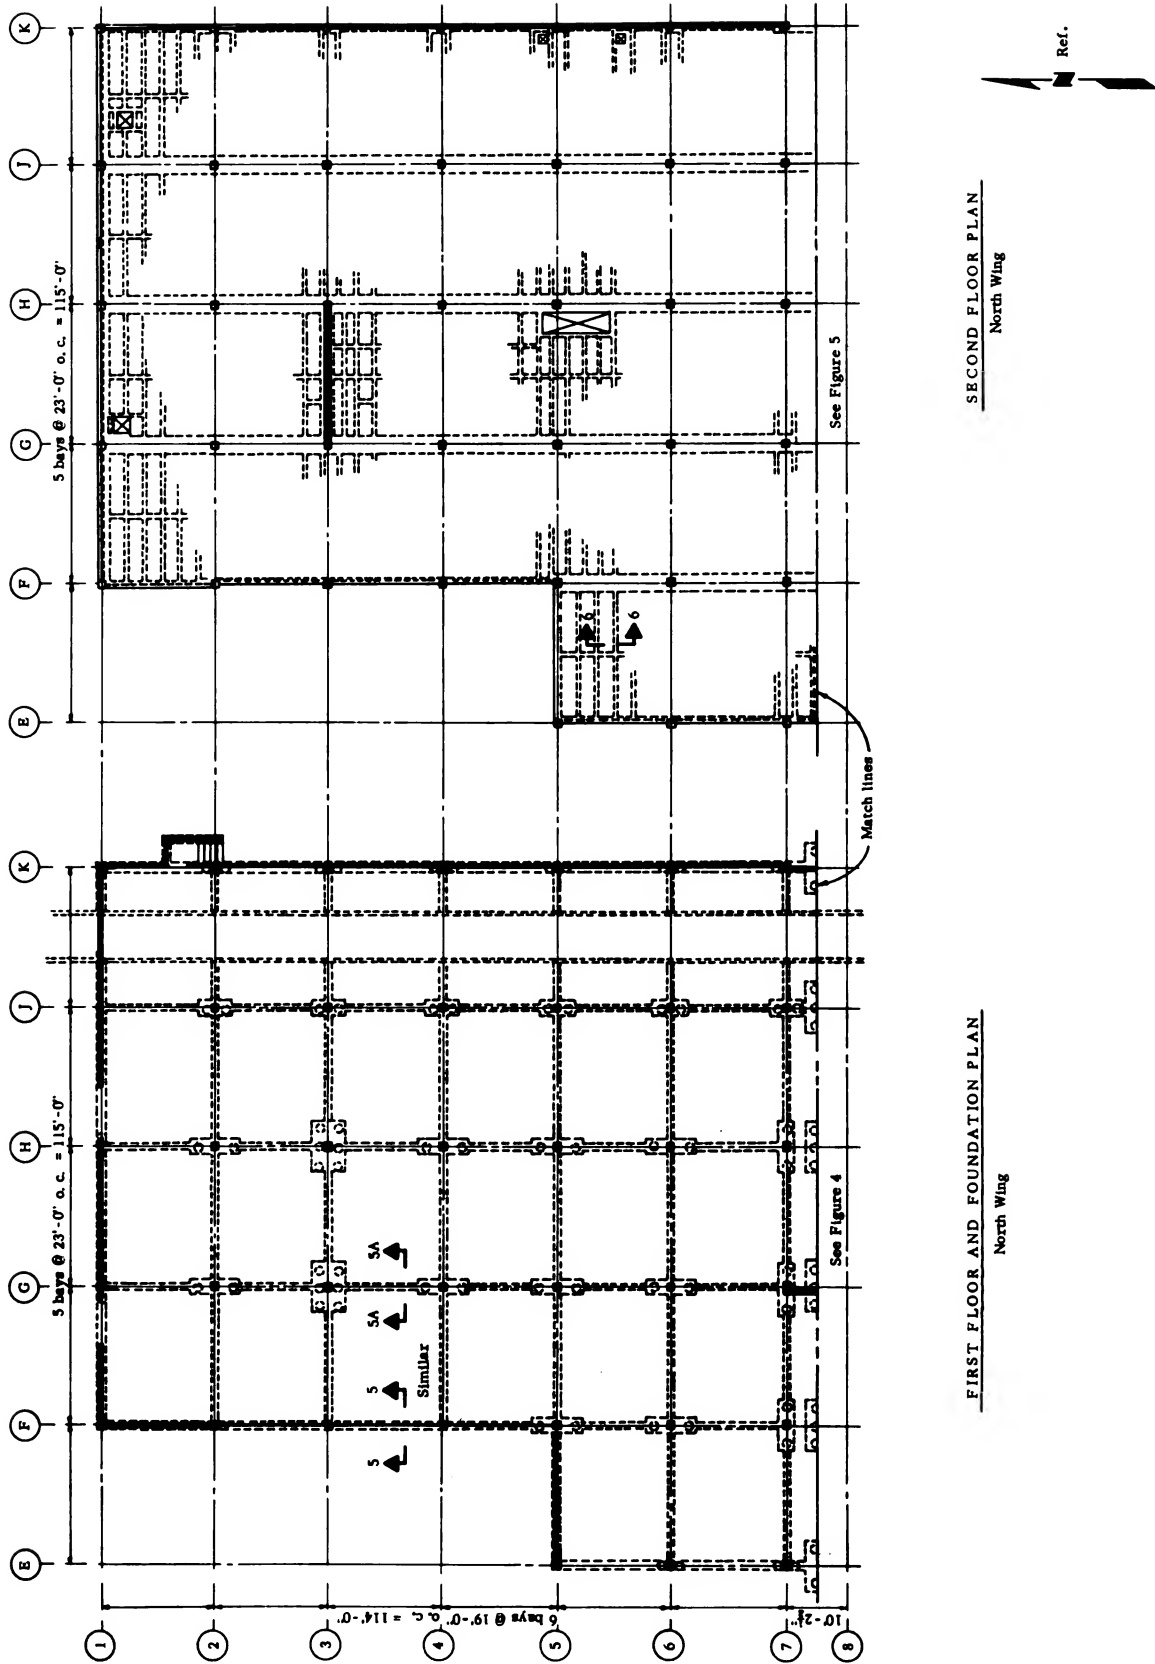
Holy Cross Hospital. Floor framing plans, north wing. No damage to first and second floors.
